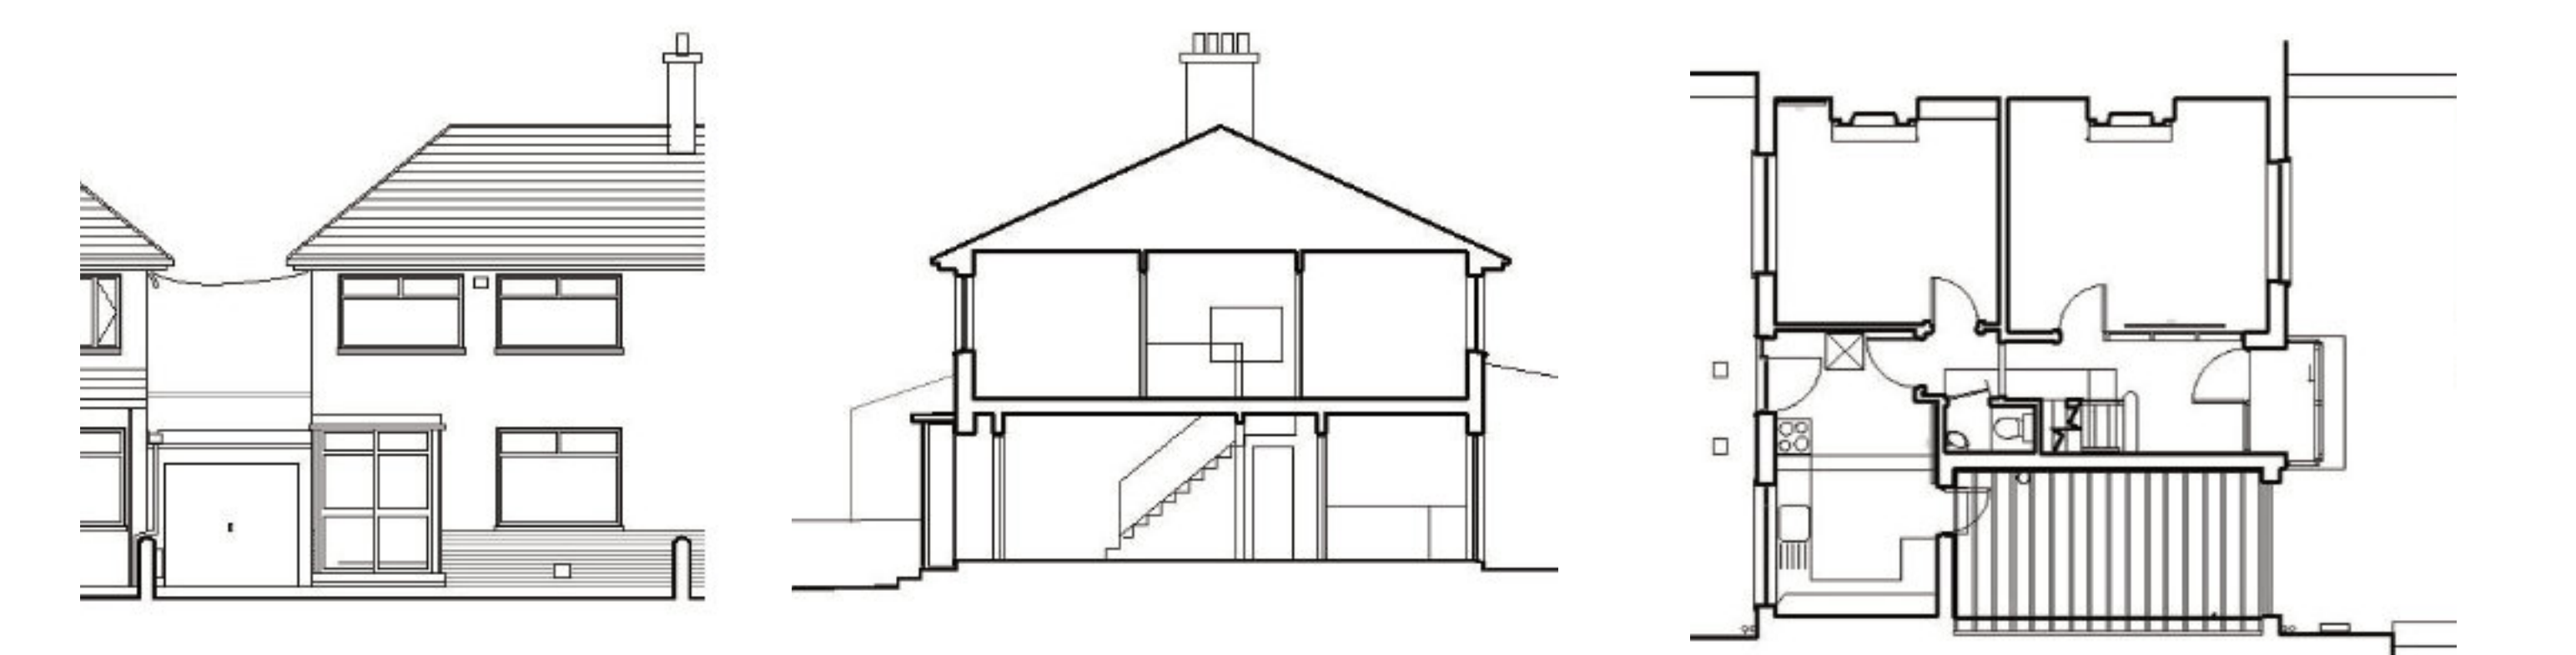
Case Study ; Typical Suburban Semi-Detached House
